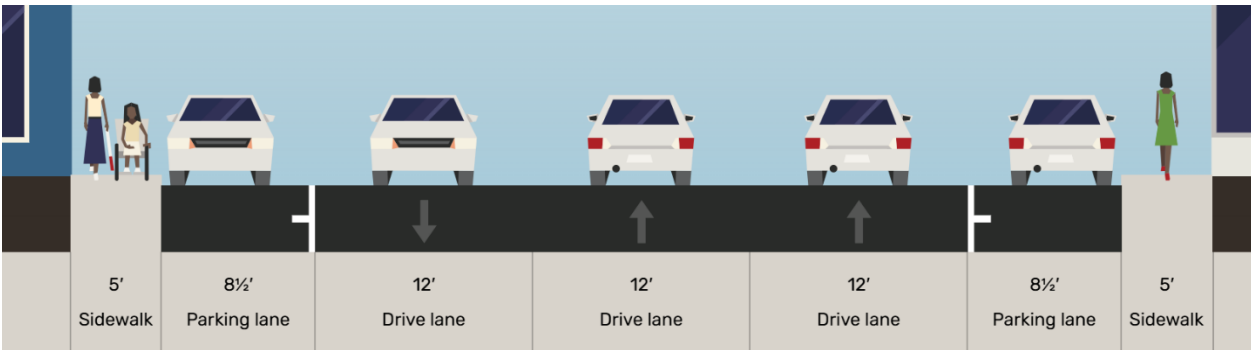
EXISTING TYPICAL SECTION (ELYRIA AVE TO 10TH ST)
